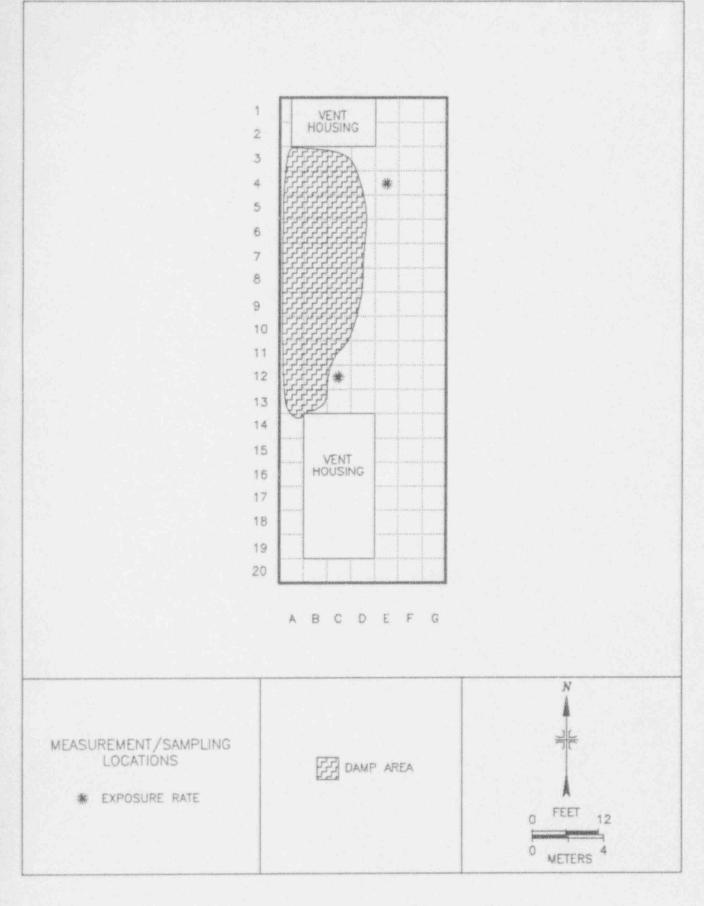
Building 65, Lower Roof - Exposure Rate Measurements
